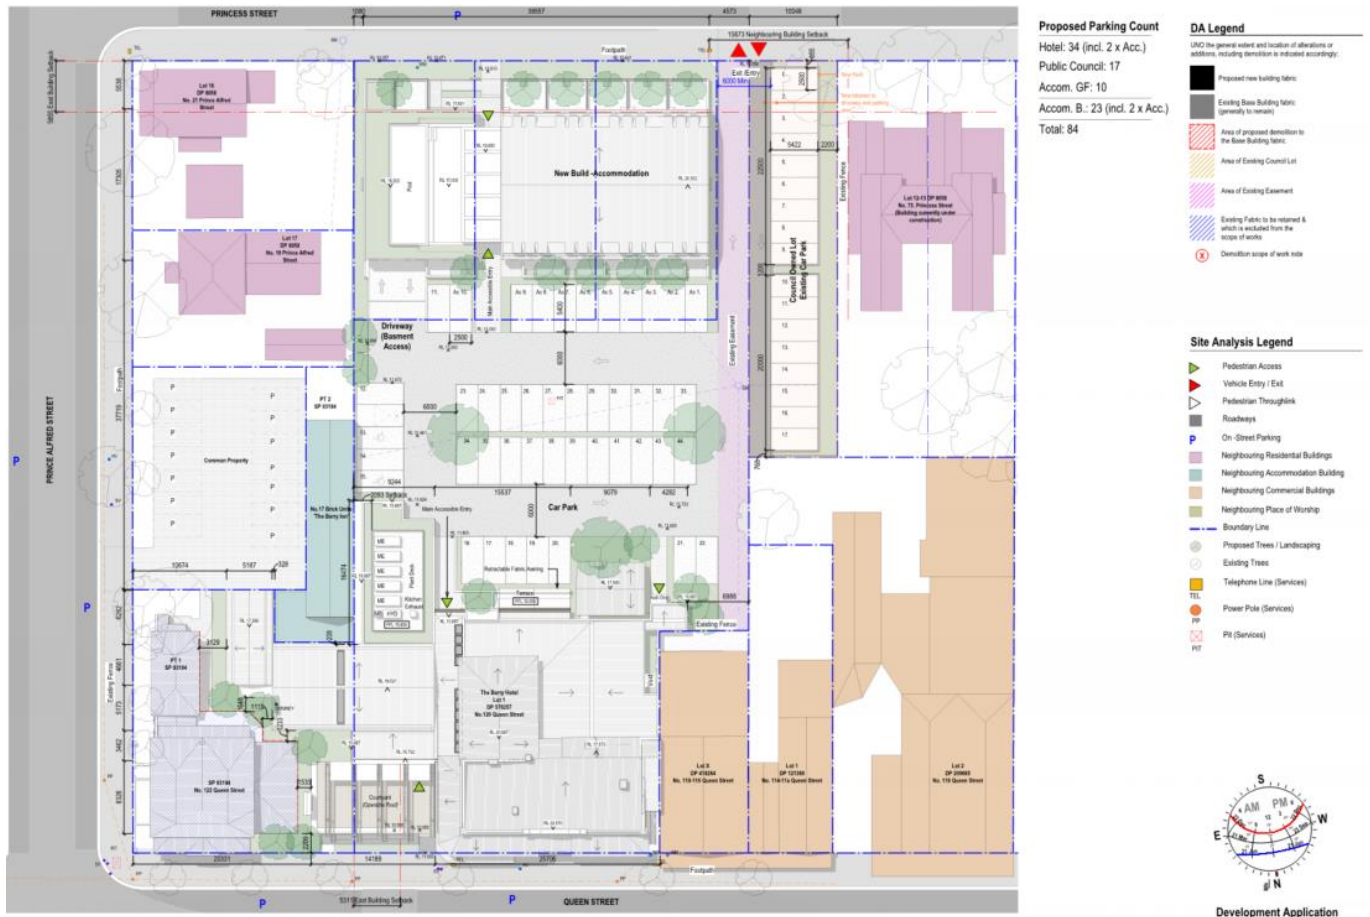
Extract from Site Plan submitted with the DA (H&E Architects, 2023)
